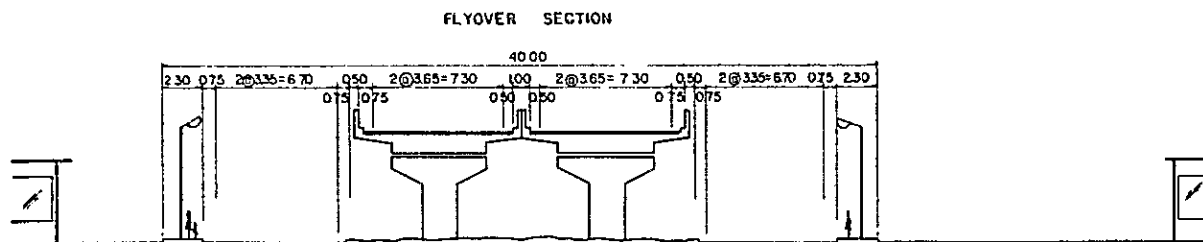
VIA BOLIVAR FLYOVER CROSS SECTION
